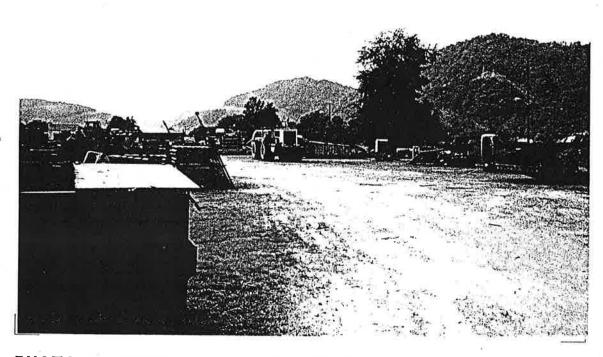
ROWS OF HEAVY EQUIPMENT FACING SOUTHEAST [JUNE 24, 1992]
